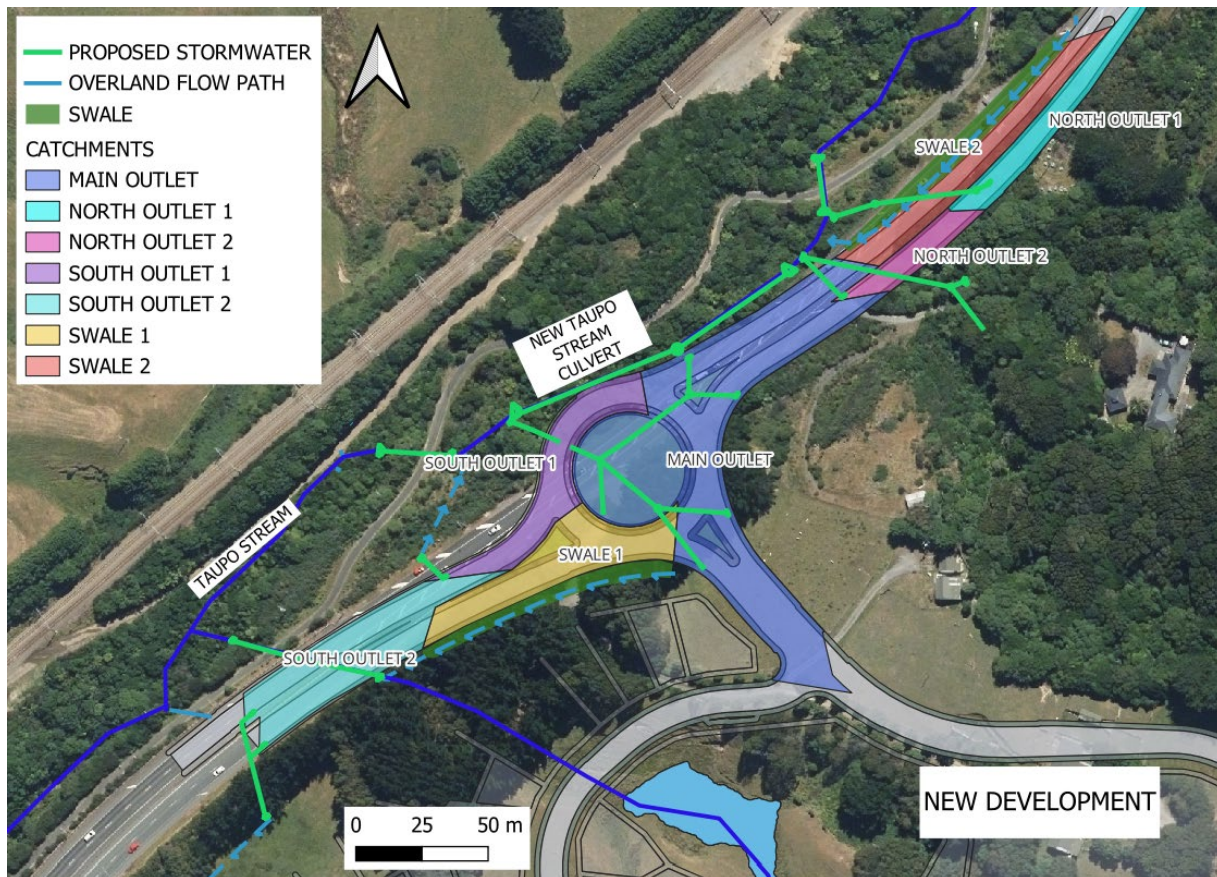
Roundabout catchments and proposed stormwater infrastructure
